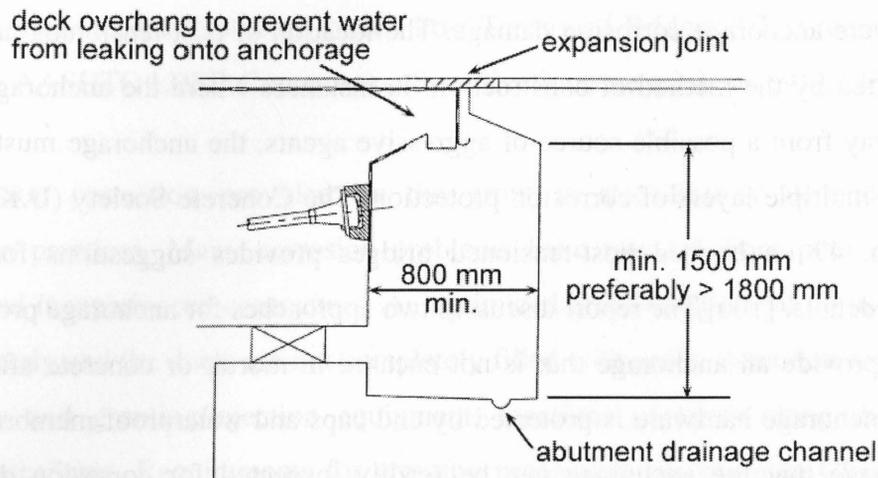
Member End Details for Anchorage Corrosion Protection [97]
